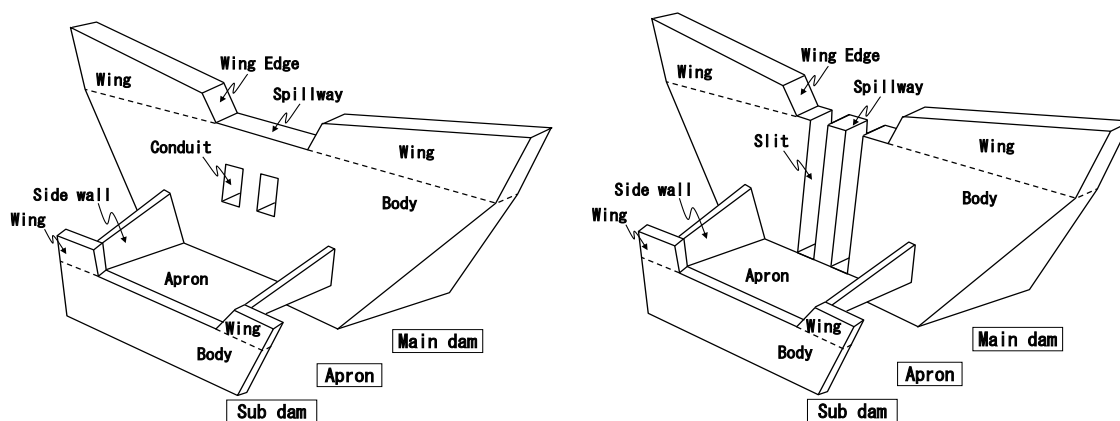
Schematic diagram of open-type sabo dams (left: conduit type, right: slit type)
